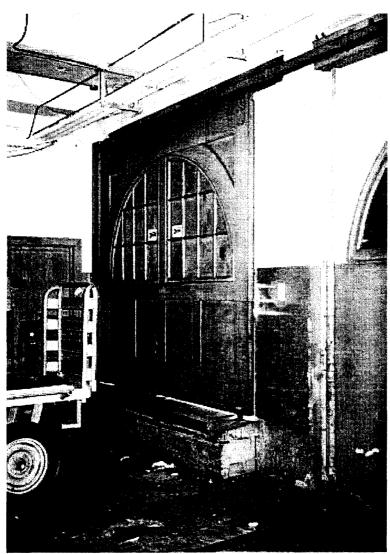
Sliding baggage door with arched glazing, facing southeast.
